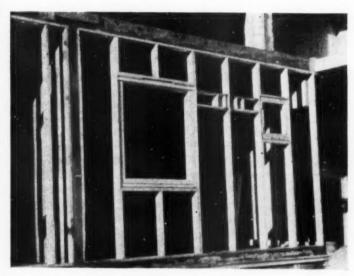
Flats at Bergen. Storey height timber frames before cladding with asbestos cement tiles.
